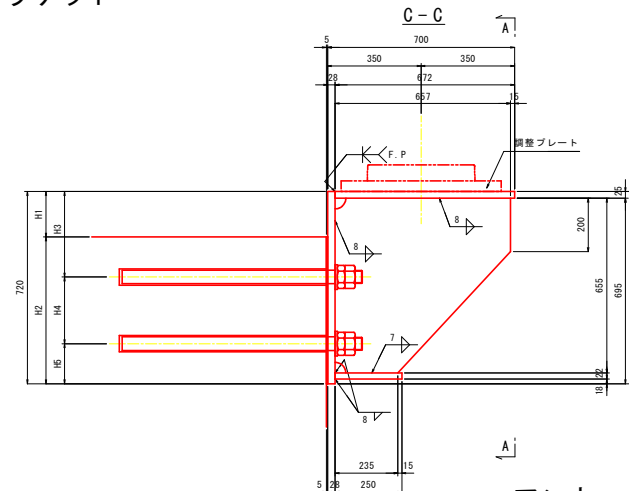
illustrates the construction details for a wall-to-ceiling joint. The diagram shows a cross-section of a concrete wall and ceiling slab. Key components and dimensions are labeled:
